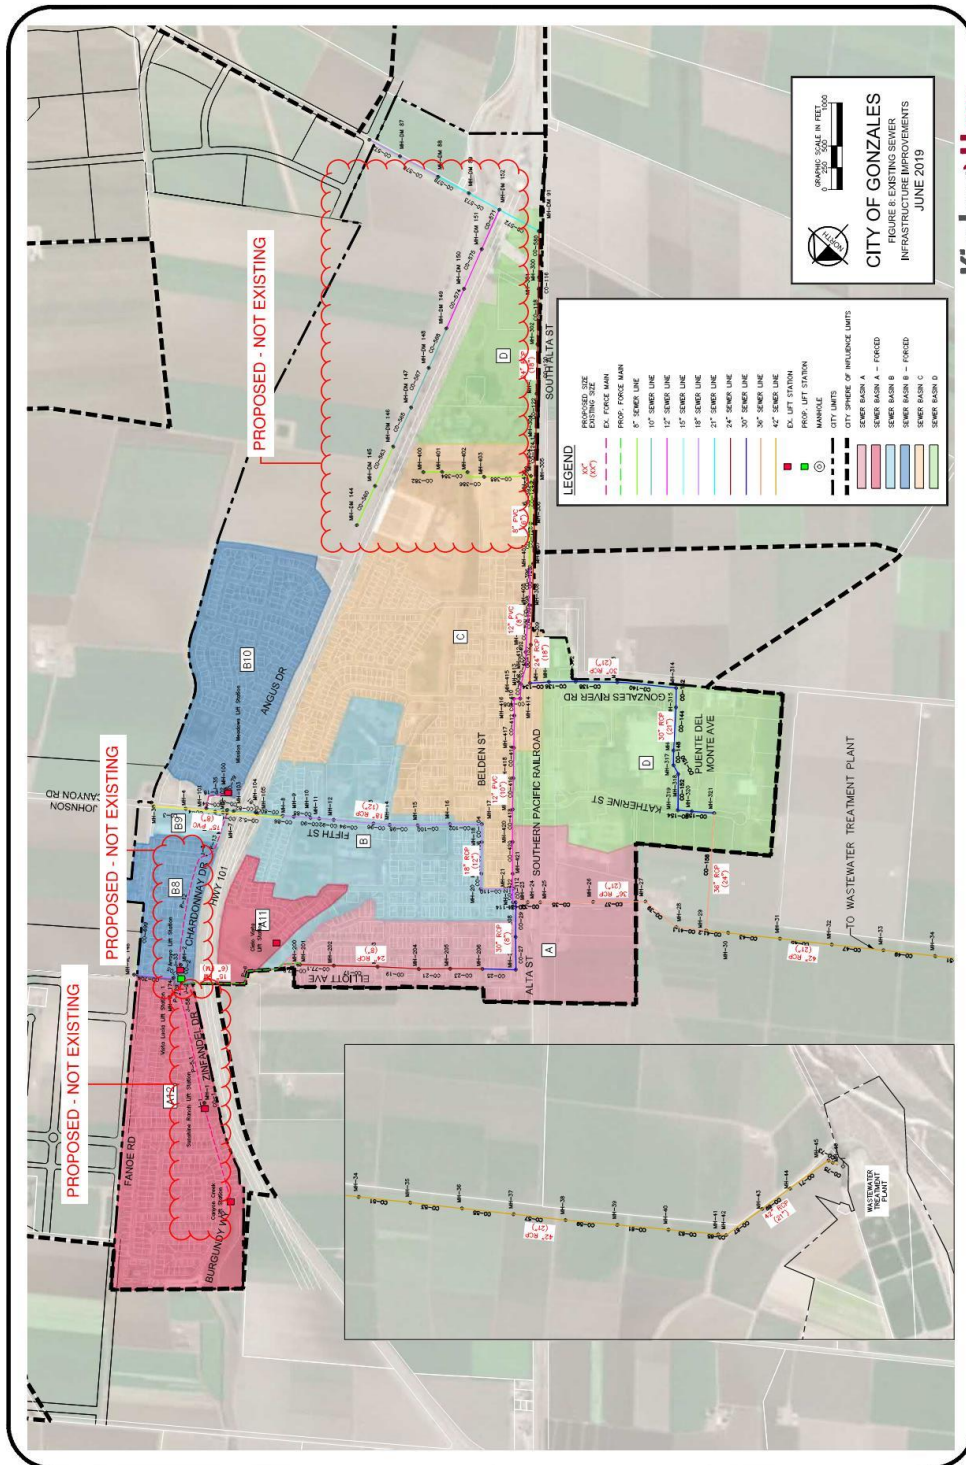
Existing / Proposed Collection System (Source: 2019 Gonzales Wastewater Master Plan, Kimley-Horn)
